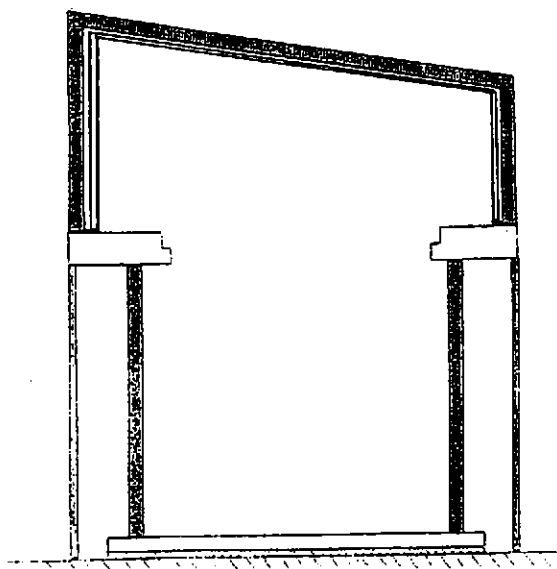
VERTICAL SECTION THROUGH THE FLOOR TRANSMISSION SUITE.
